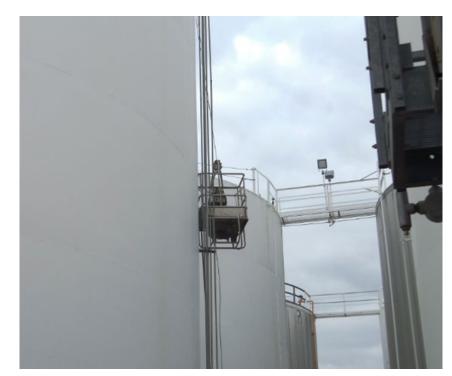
Single-point Suspended Scaffold Used for Inspection and Repairs on Exterior of Tank
